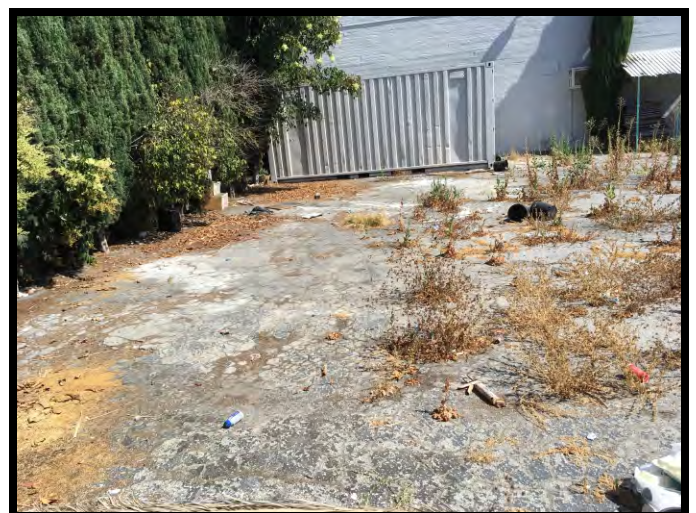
View of west side of parking lot looking at storage container in northwest side of parking lot.
